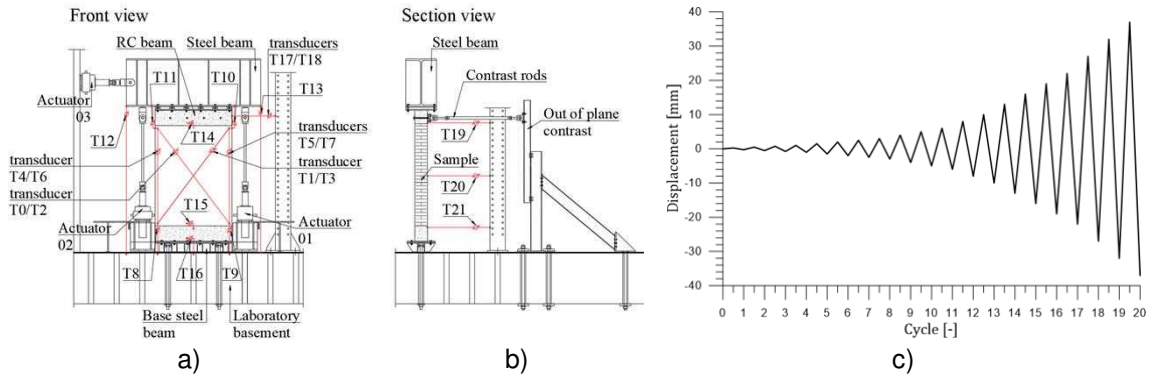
a) Front view of the test setup; b) section view and c) example of a loading time history.
